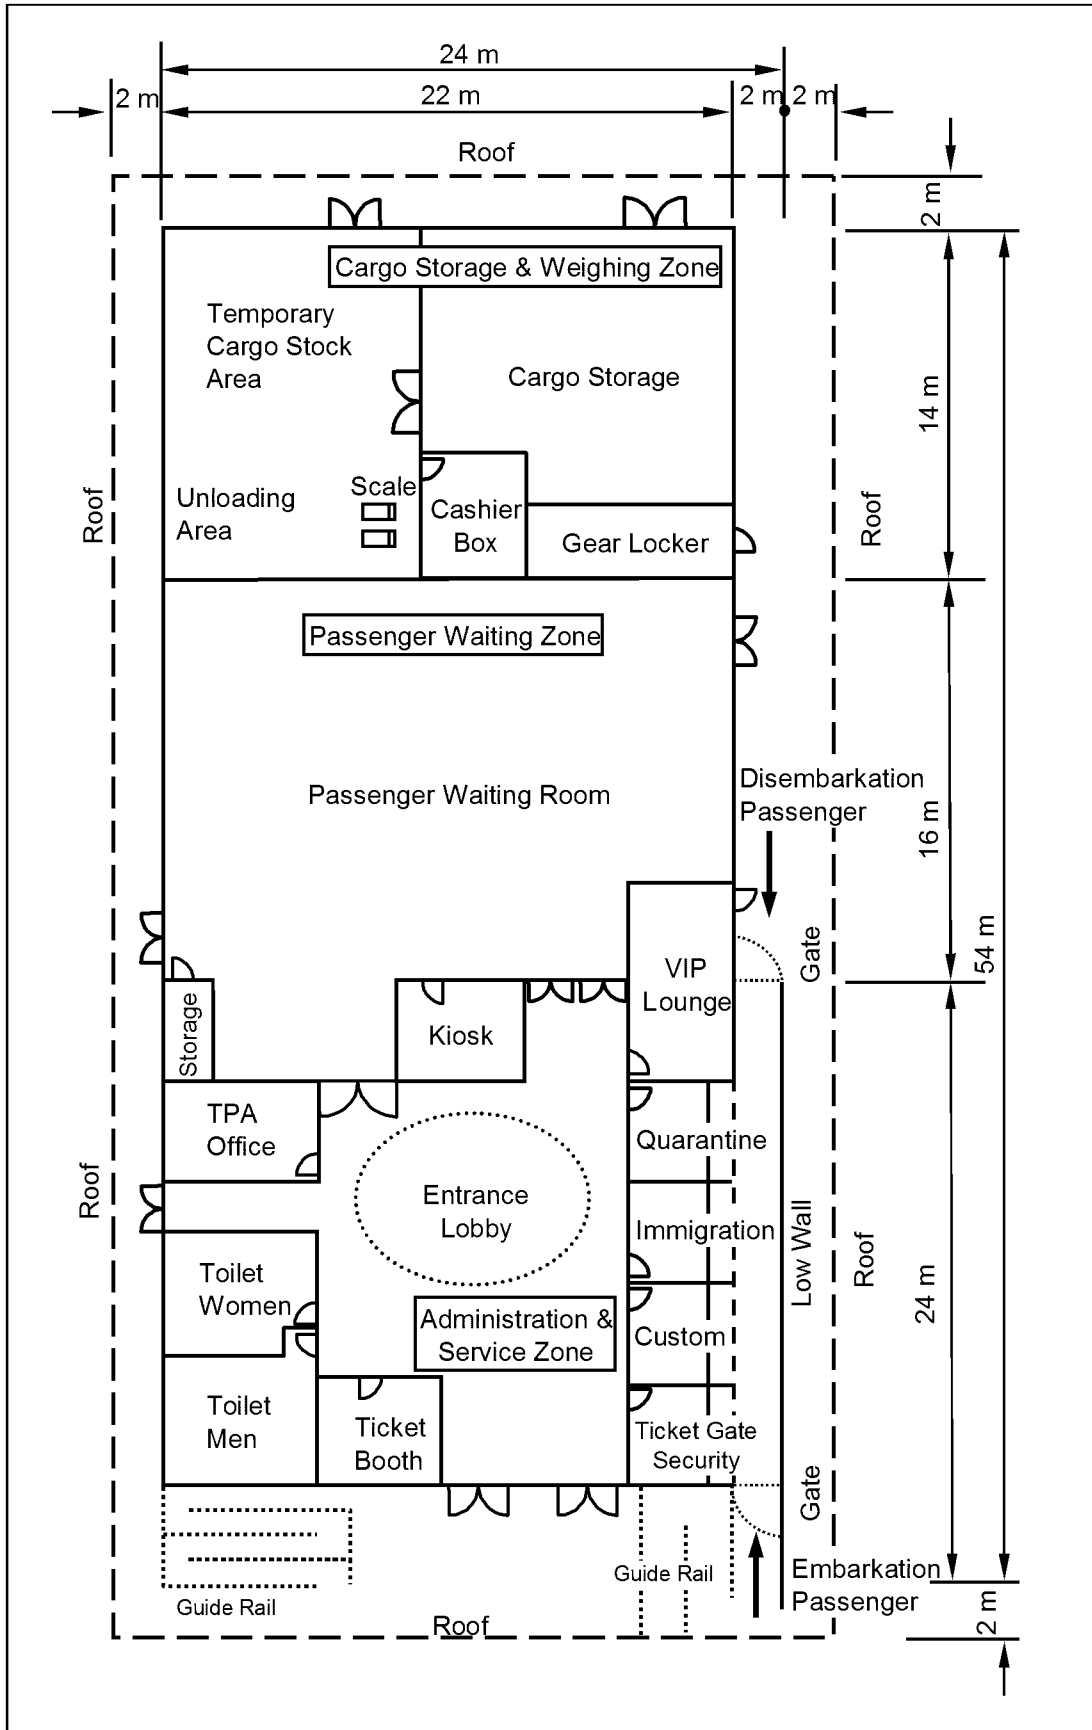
Layout Plan of Passenger Terminal Building
